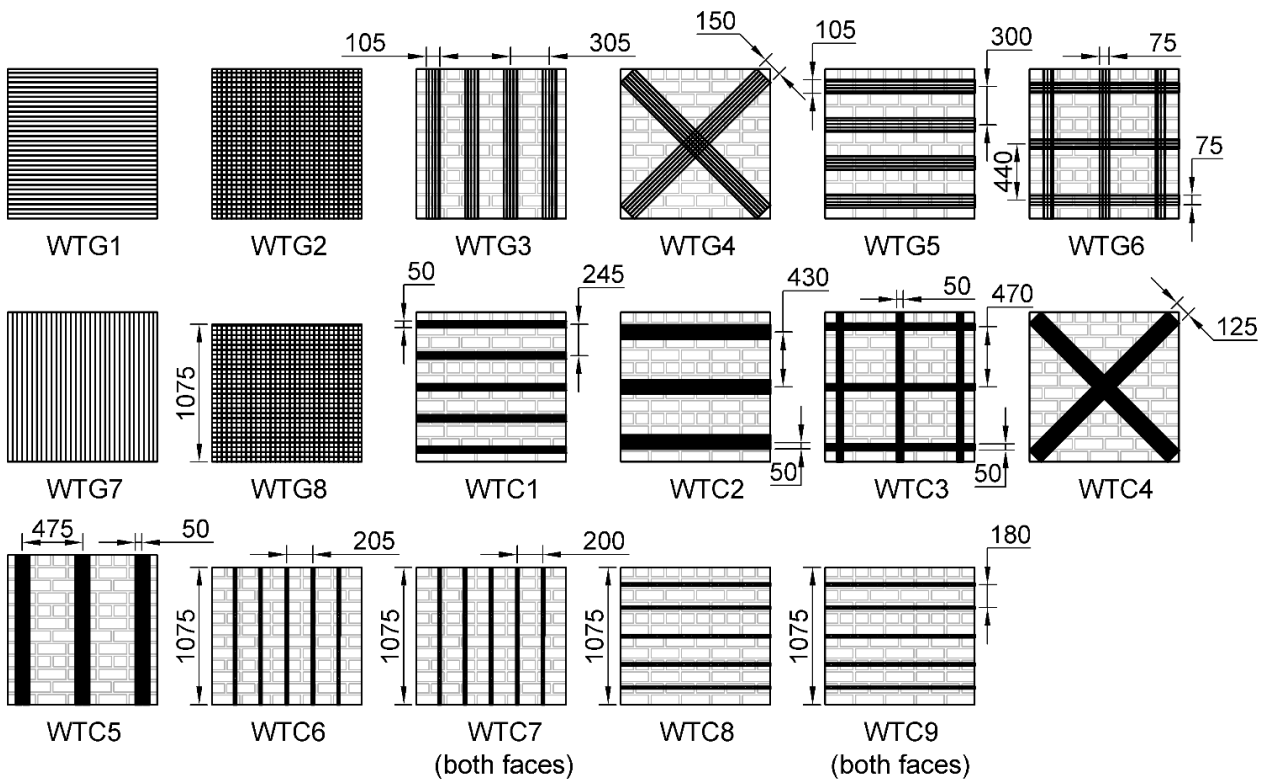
FRP retrofit details (all dimensions in mm). Walette height is 1170 mm unless otherwise noted.
